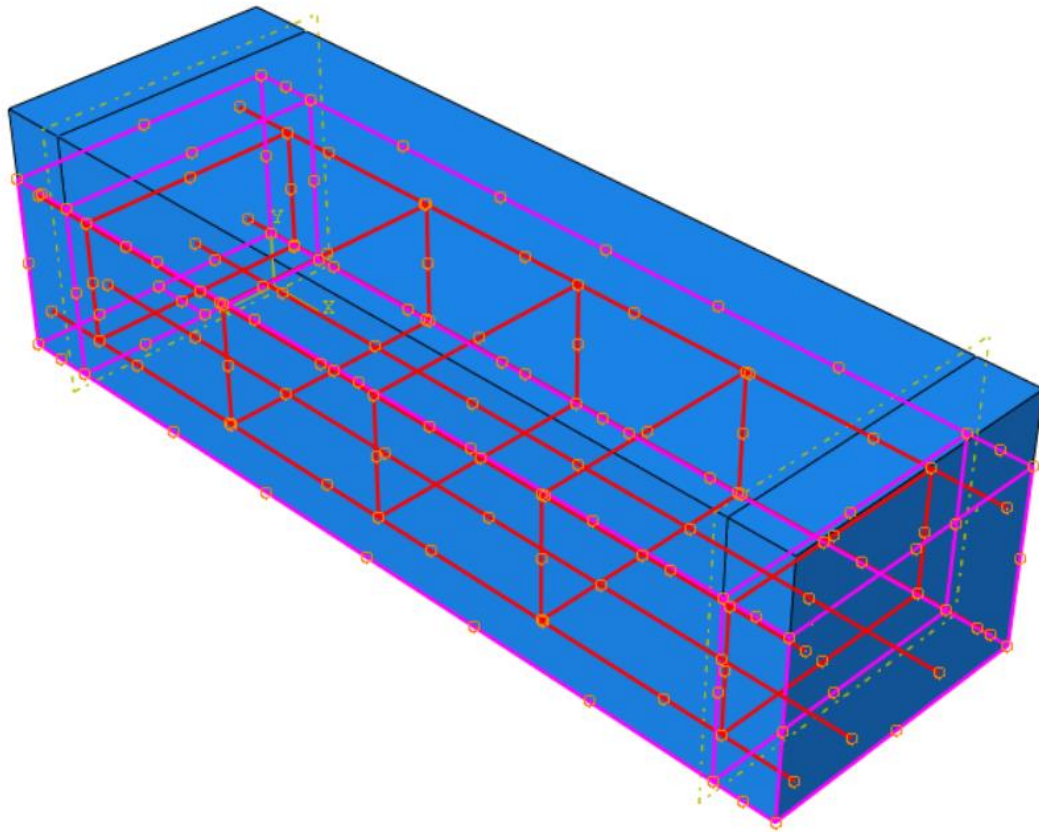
Interaction between reinforcement and surrounding concrete.
